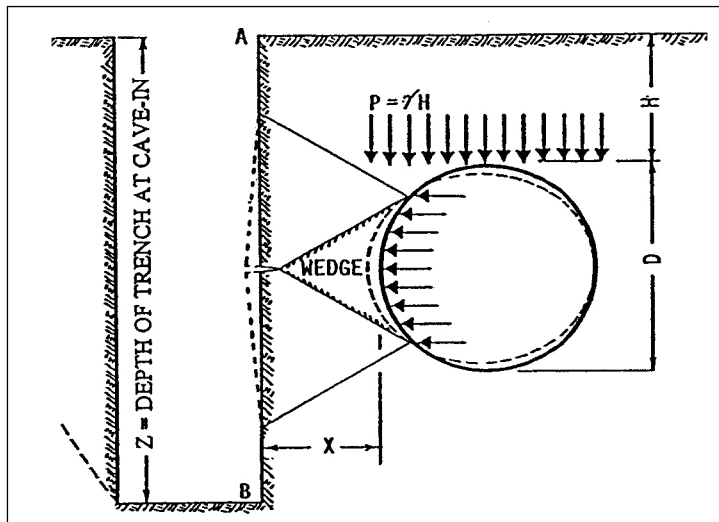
Vertical trench wall parallel to a buried flexible pipe, showing the soil wedge and shear planes that form as the pipe collapses.
